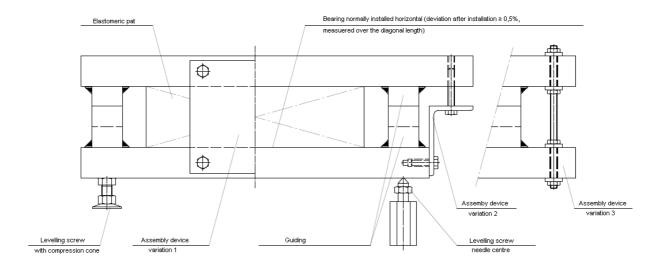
Side view of elastomeric bearing combined with guide bearing according to DIN EN 1337-8 [6]
